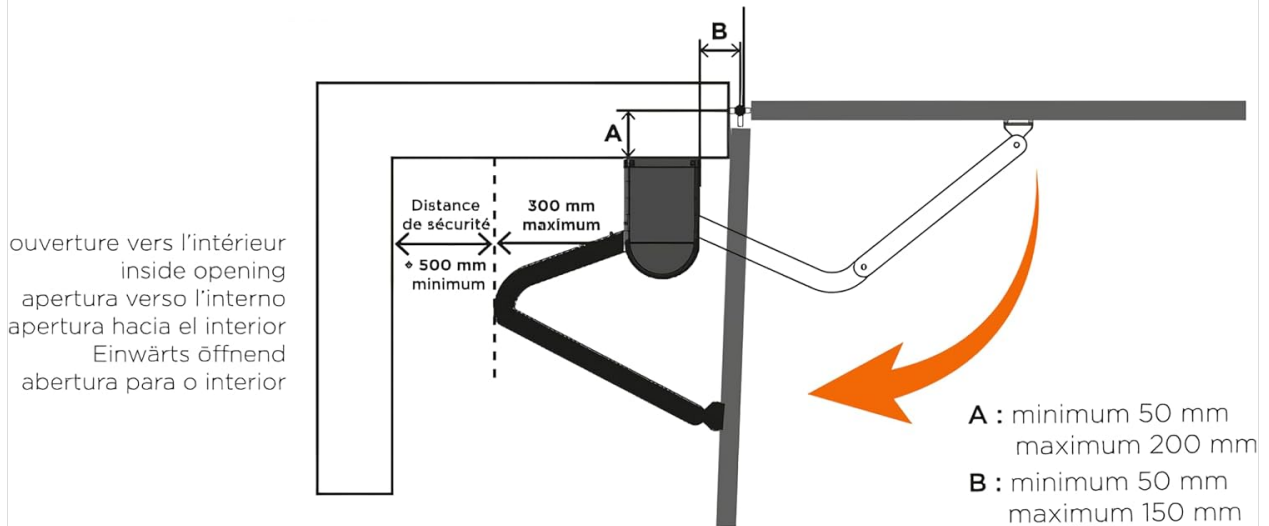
Important fitting dimensions for proper installation. Ensure minimum 50mm and maximum 150mm for dimension B, and minimum 500mm for safety distance.
